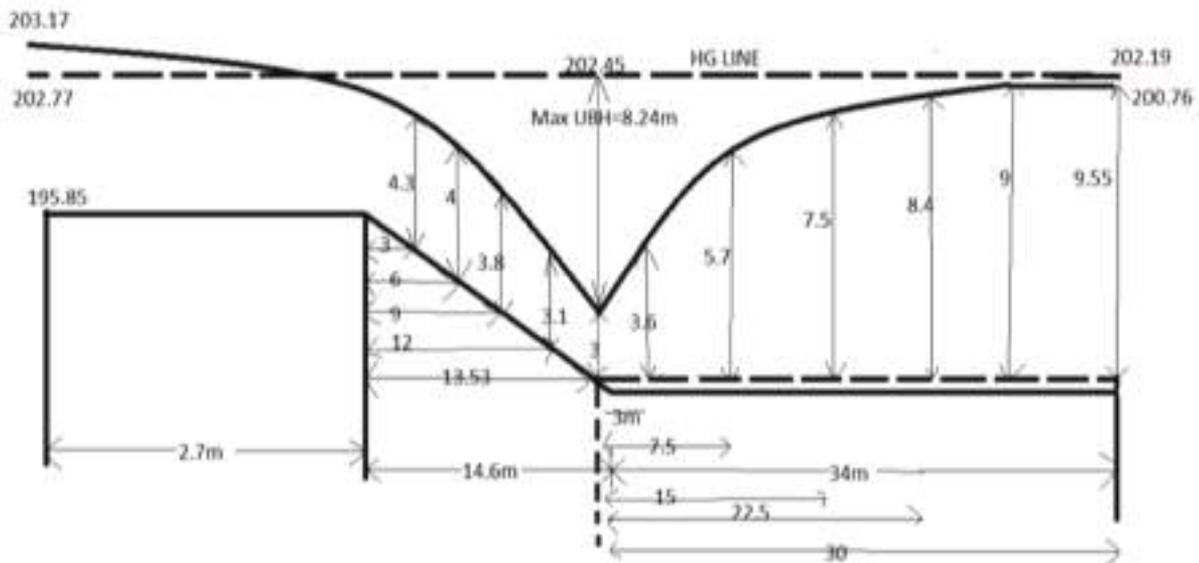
Barrage Structure and Fall of Water at Barrage due to Artificial Construction⁴⁴
